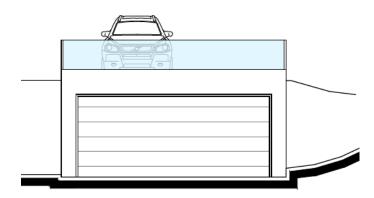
Proposed west elevation. Extract from drawing number: 1610/P-102
